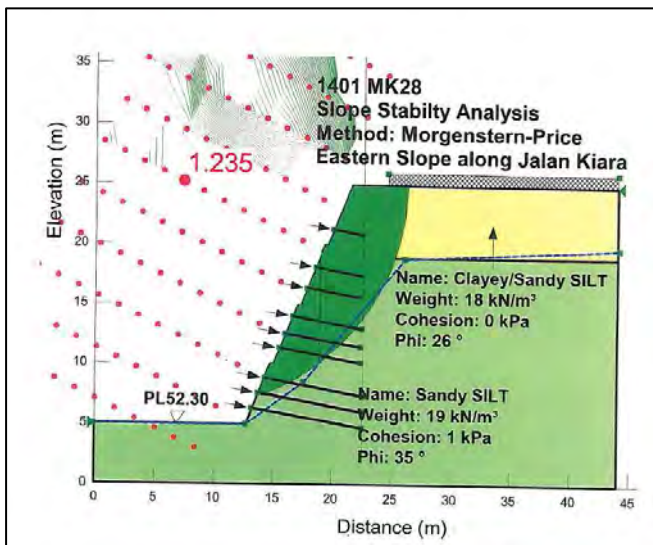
Incorrect FOS reported in original design of soil nail slope.
